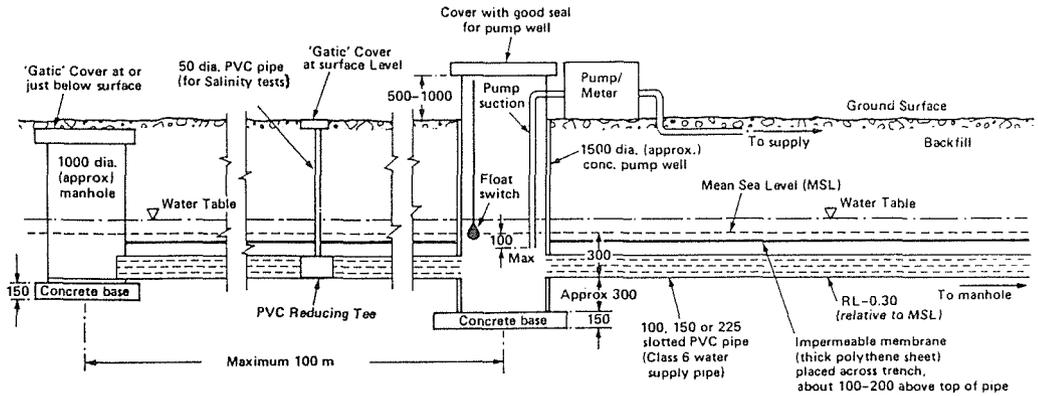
Cross section through an infiltration gallery (Falkland, 1988).
